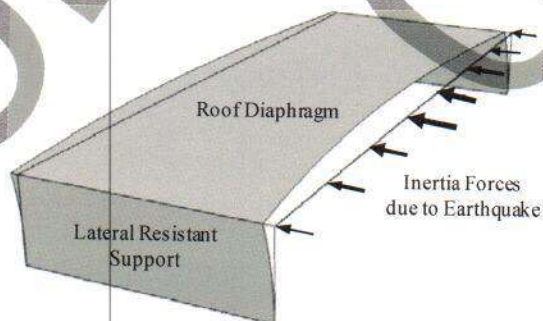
Inelastic deformation of deck diaphragms in typical single-story structures during a severe earthquake
